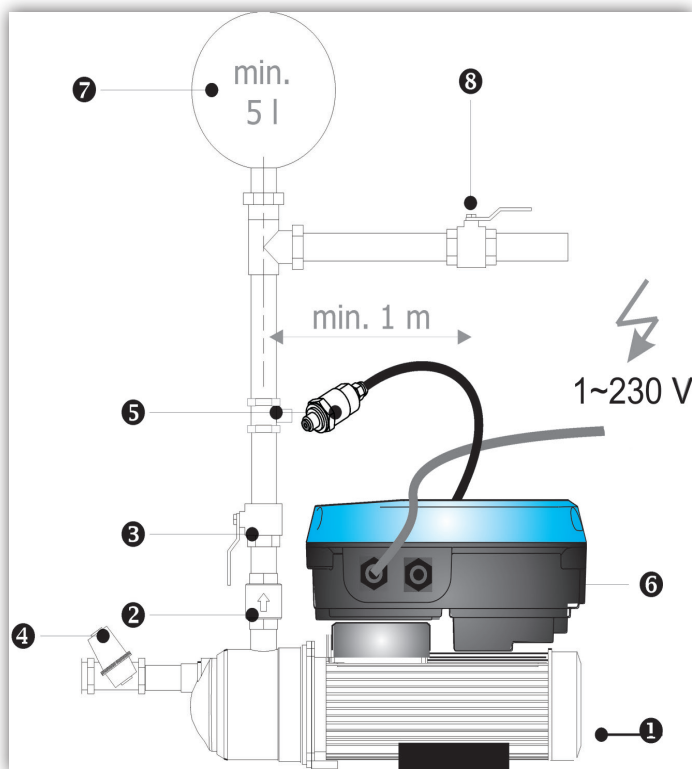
INSTALLATION SCHEME - SCHEMA IMPIANTO - ESQUEMA MONTAJE-SCHÉMA INSTALLATION
